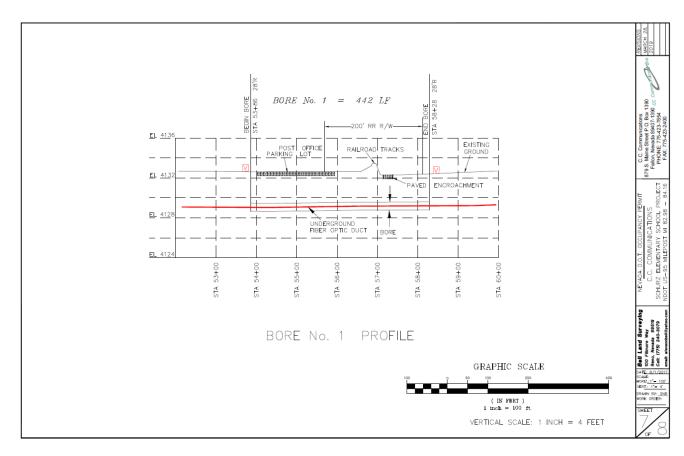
HDD Detail, Typ. (Railroad and Road Crossing)
